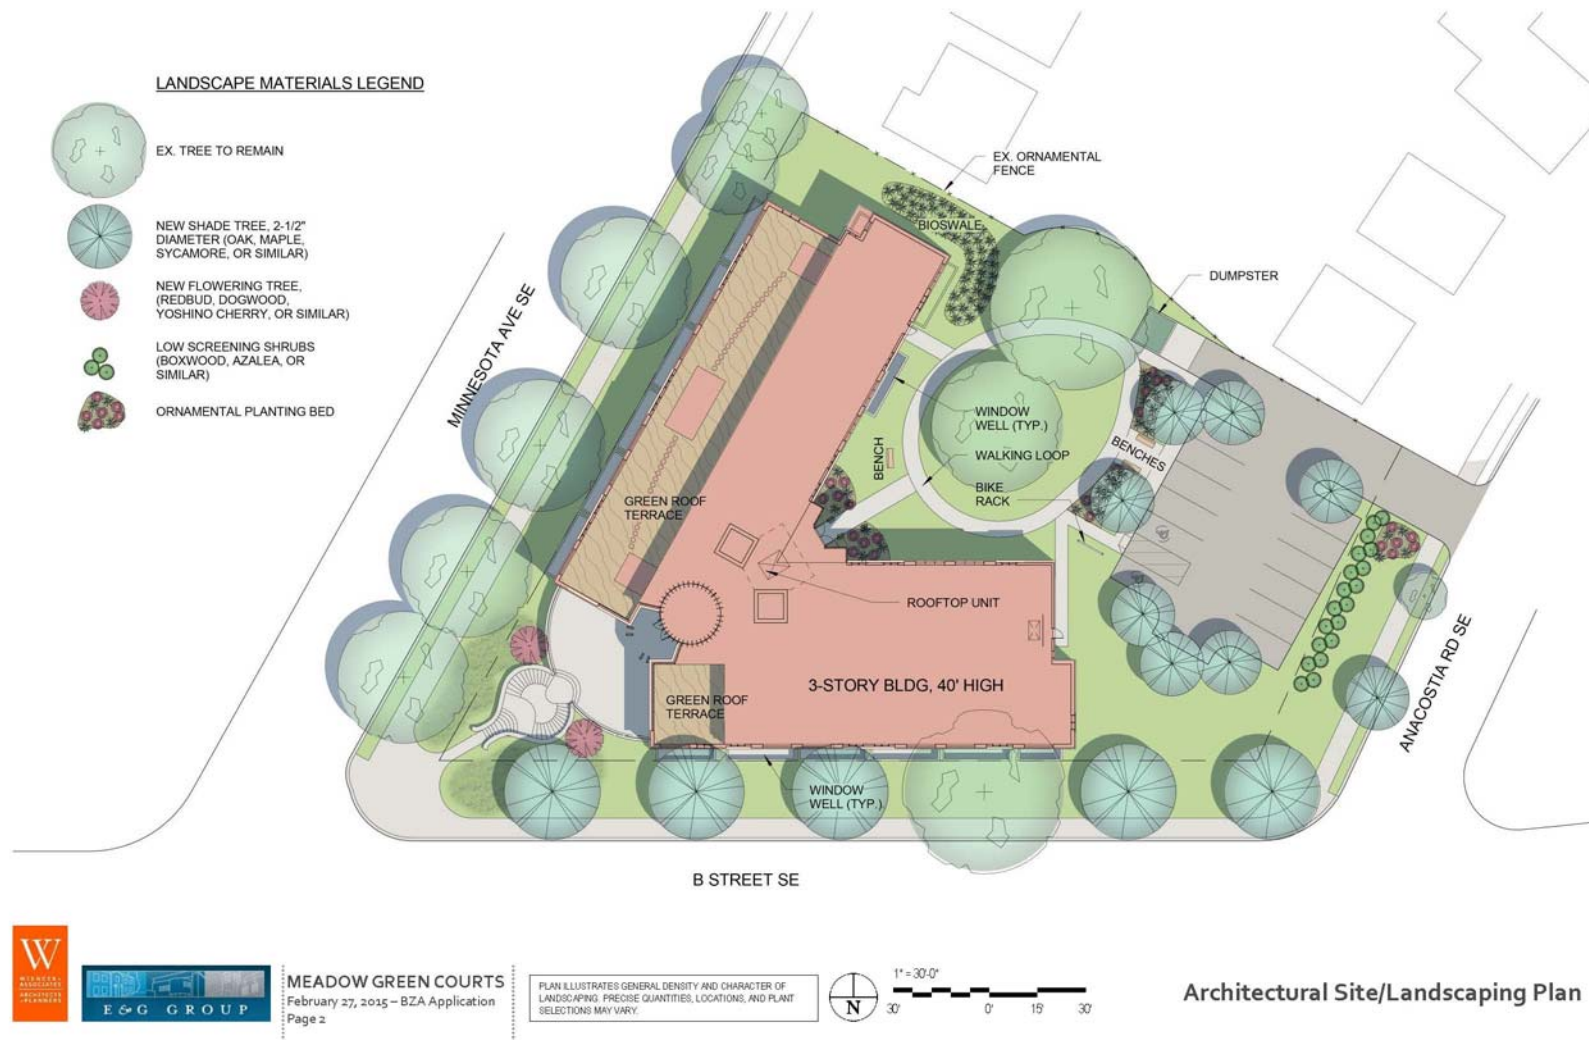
3605-3615 Minnesota Avenue, SE (Meadow Green Court) Site Plan
